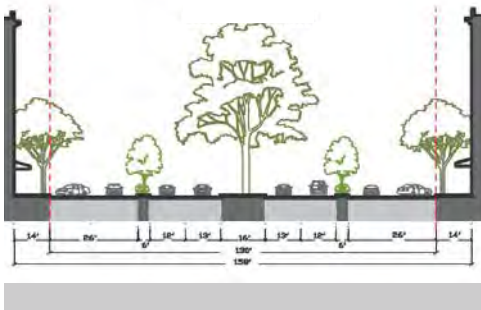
Shattuck Avenue. Bike lanes are proposed on Shattuck (photo & 1st section). Where parking access lanes are maintained, bike lanes would run just outside of traffic through lanes (2nd section).
